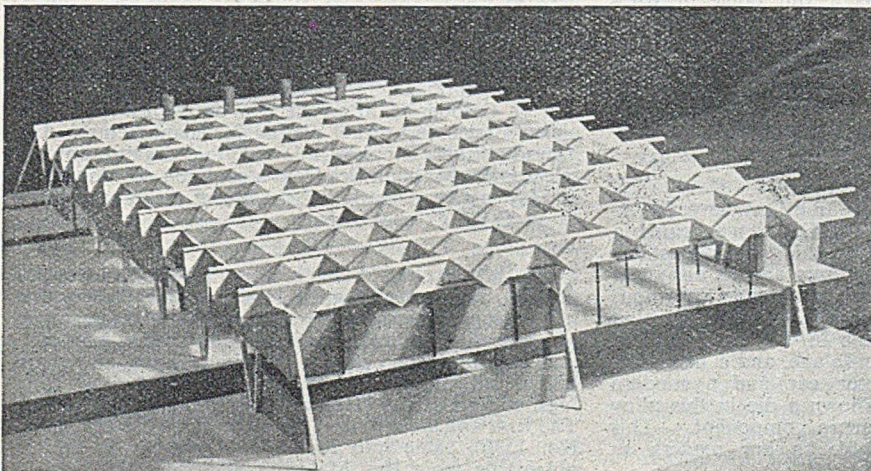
Model of the Foundry constructed to conform to the Authors' Designs, showing the Roof Construction adopted.
